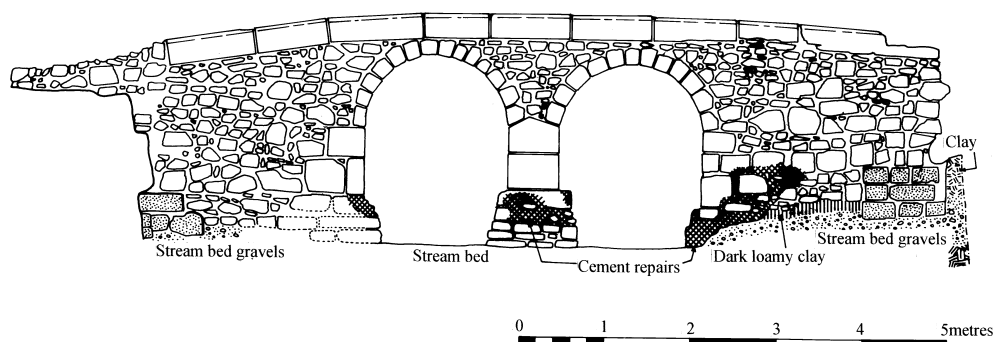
Western, downstream elevation; Period 1 masonry stippled
